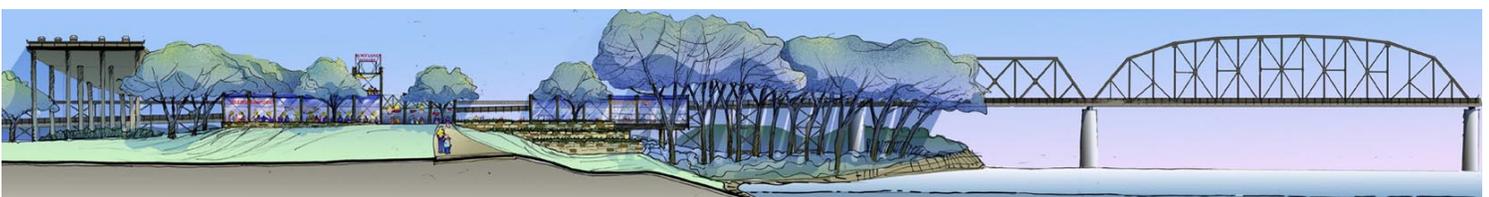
Section illustrating the proposed visitors area and restaurants at the end of 31st Street overlooking the Ohio River. The visitors area will contain an expanded Portland Museum with new archeological facilities as well as a gift shop.
